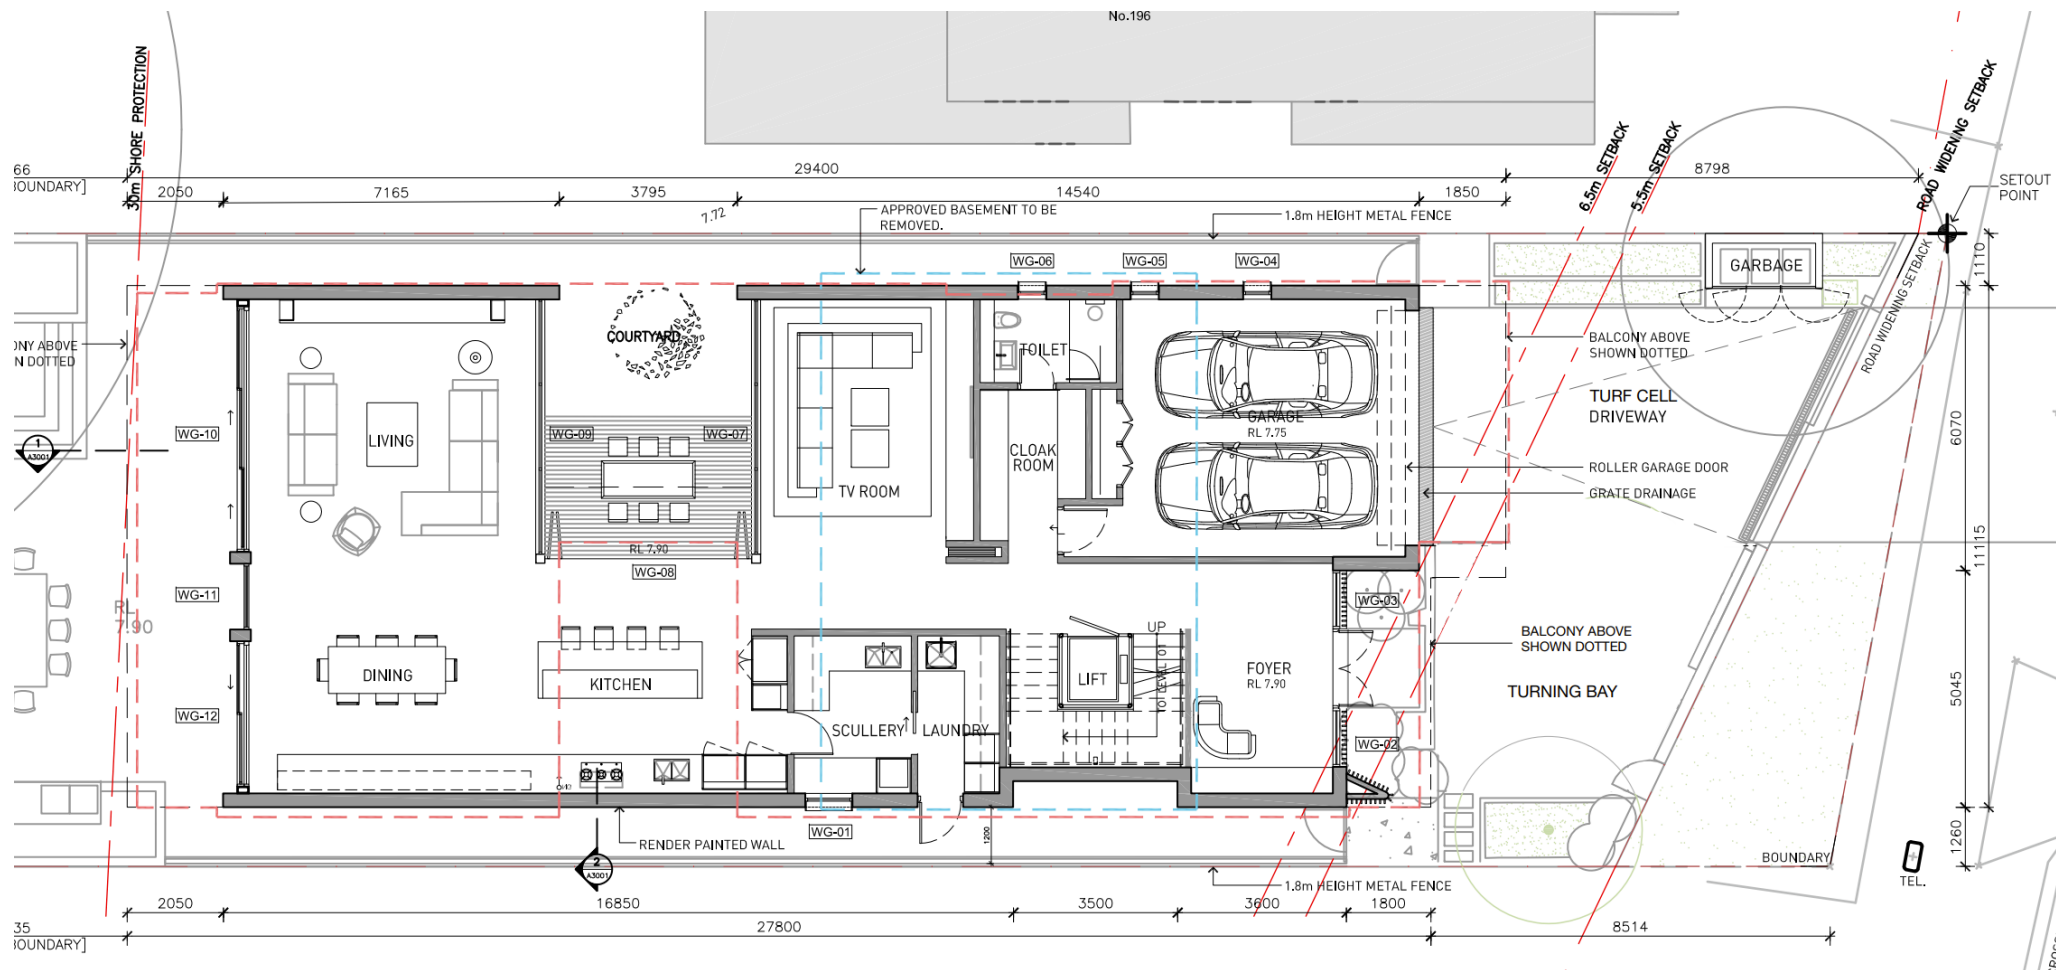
Ground Floor Plan for DA-667/2017/A prepared by PTW Architects.
